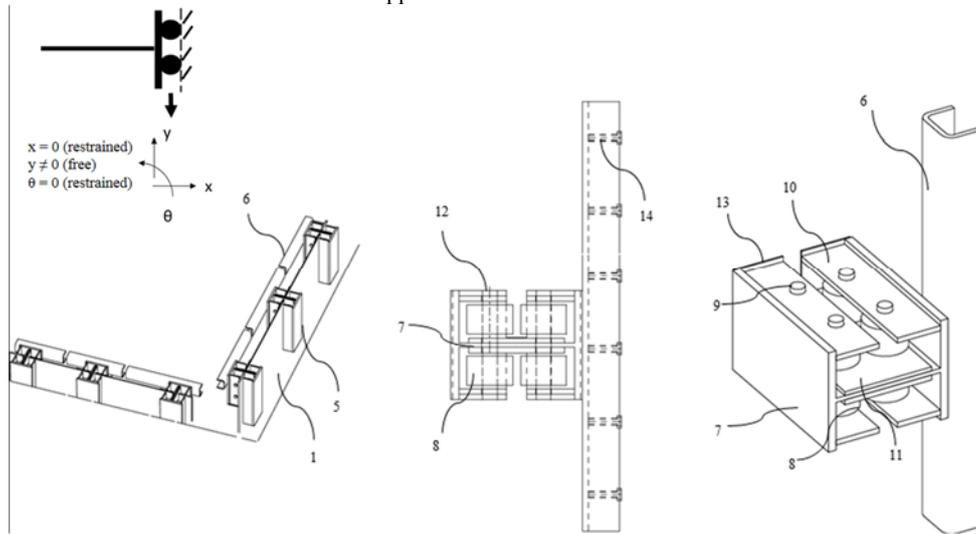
Connection mechanism that satisfy symmetrical boundary conditions: CAD drawing of a linear bearing system which is horizontally fixed, vertically free and capable of transferring moments.
